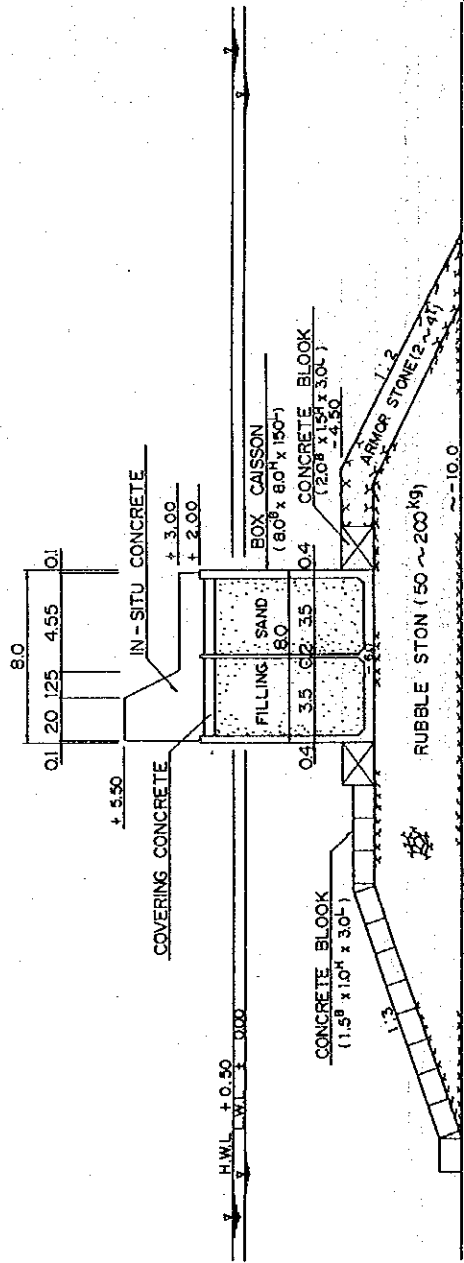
(A-g) ⑤ COAL/ORE BERTH (PLAN A AND B) (Unit: m)
